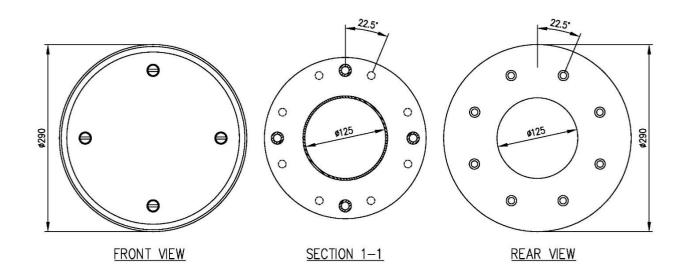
(a) DETAILS OF VENTILATION SLEEVE AND FRAGMENTATION PLATE
